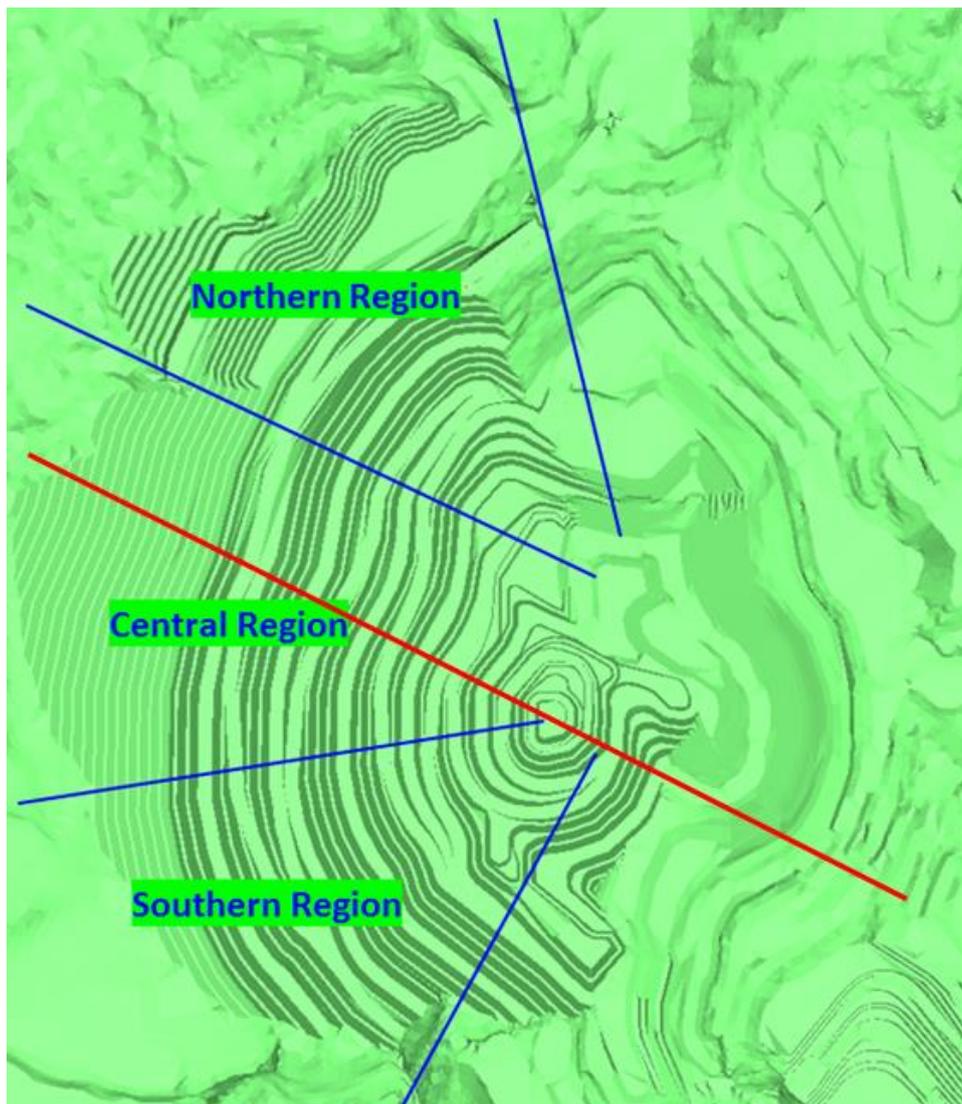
Plan view of the position of the UDEC central section relative to the west wall pit design shell
